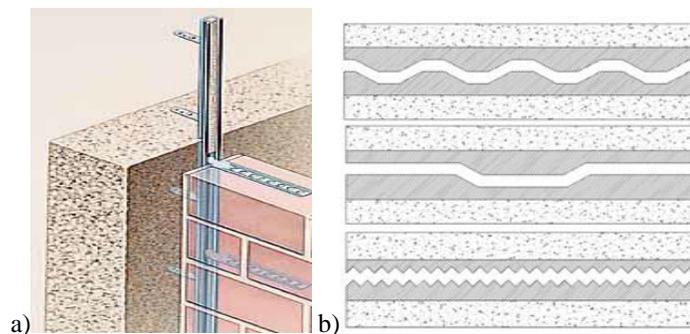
a) Reinforcement connection; b) various sliding joints configurations
